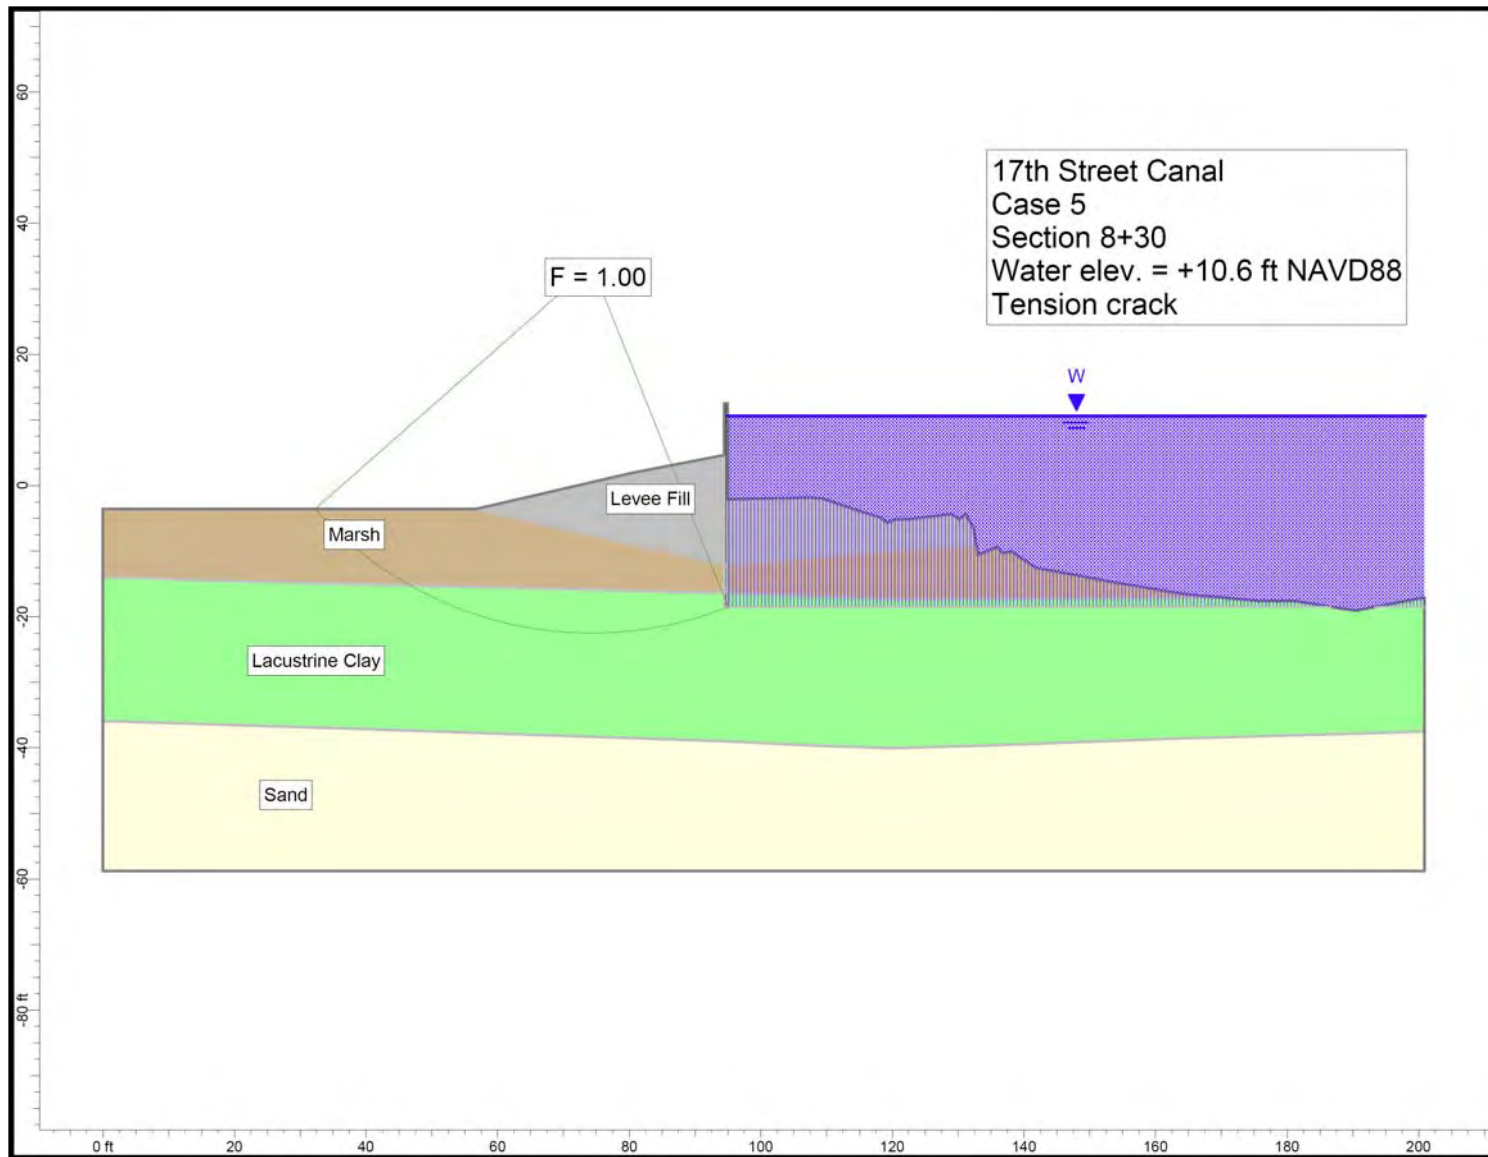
Critical Circle for 17th Street Canal Station 8+30 – Water Elevation 10.6 ft, Tension Crack.
